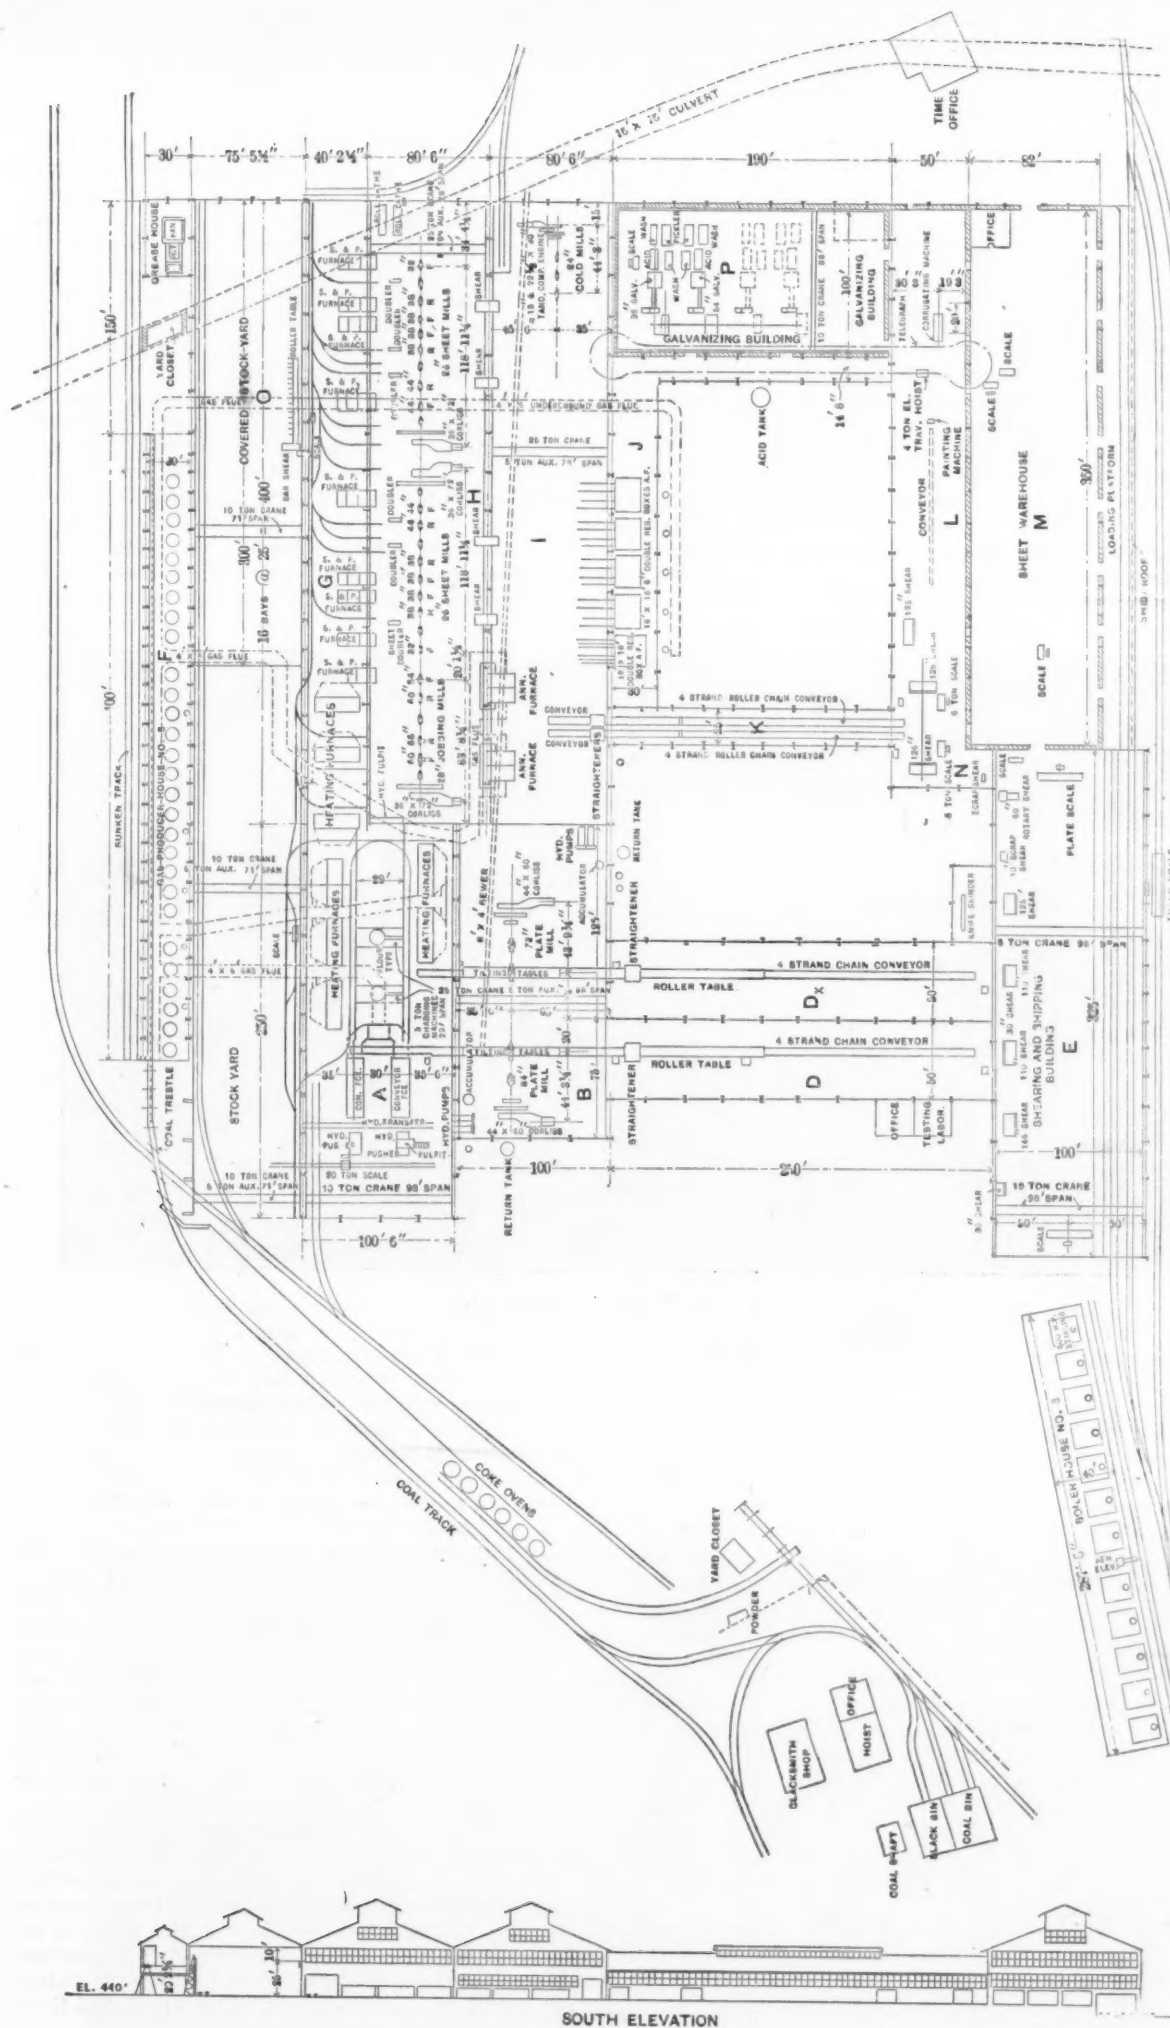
Plan of the New 72-In. Plate and Jobbing and Sheet Mills of the La Belle Iron Works.—An Enlarged Plan of the Upper Right Hand Corner of Fig. 1.
